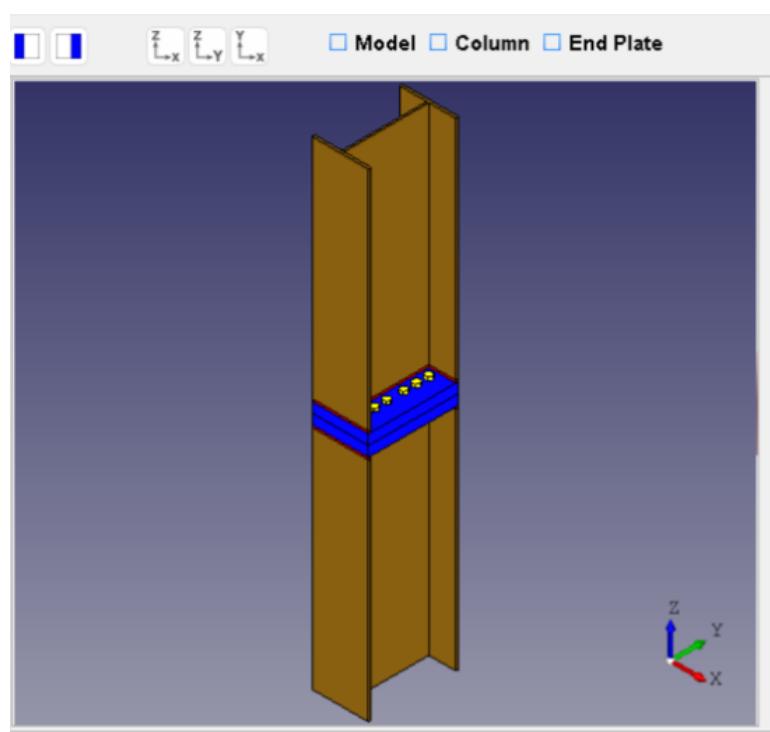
3D drawing output of typical Column-Column End Plate connection
